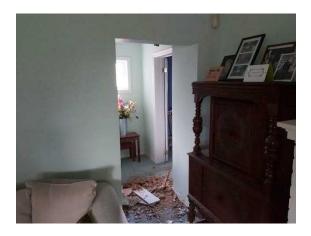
Damaged ceiling with mould above on the main floor of 2830 Carling.
